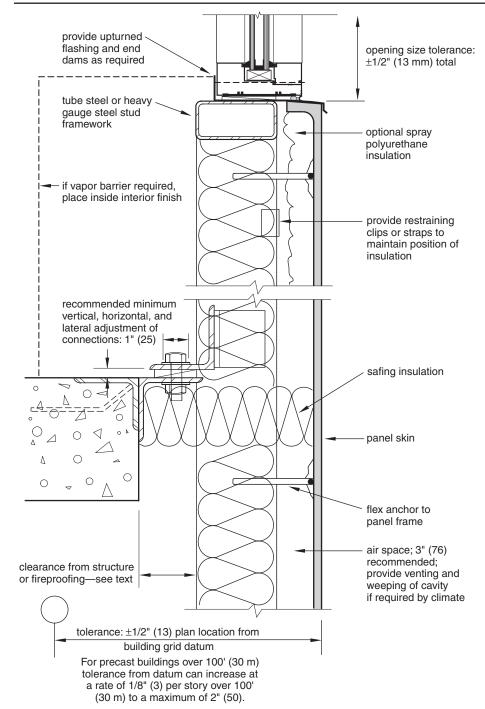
Glass fiber reinforced concrete panels 03 49 00
